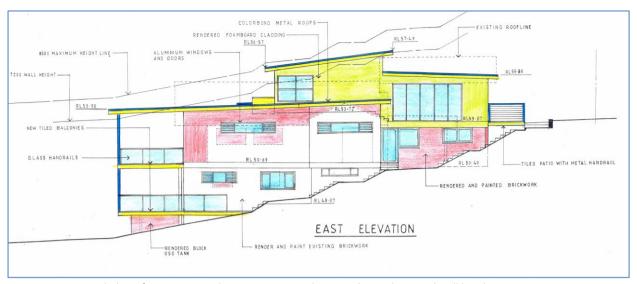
Approved plan of 25 Lancaster showing non-compliance with envelope and wall height
